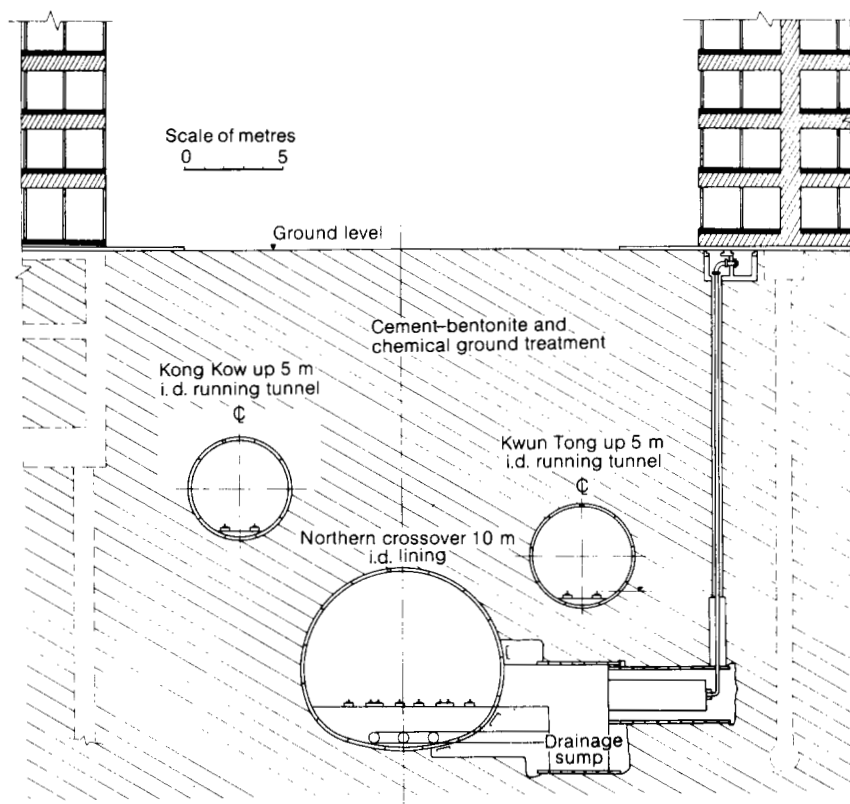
Nathan Road: cross-section through northern low-level crossover
